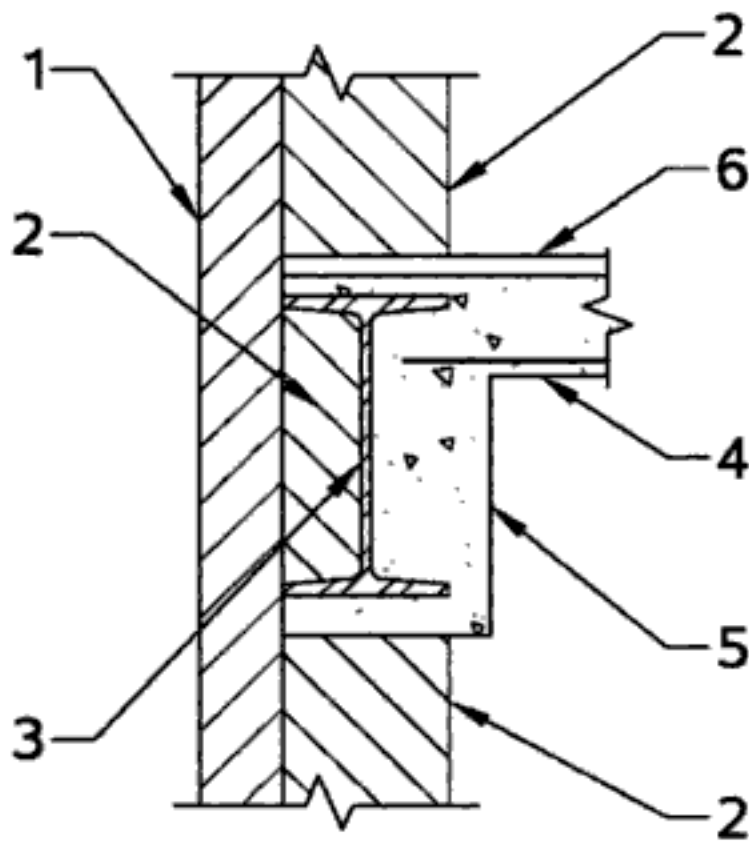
Typical spandrel section, 953 Fifth Avenue. 1 is the veneer masonry, 2 is back-up masonry, 3 is the spandrel beam, 4 is the floor slab, 5 is the concrete beam encasement and fire proofing, and 6 is cement floor topping.
